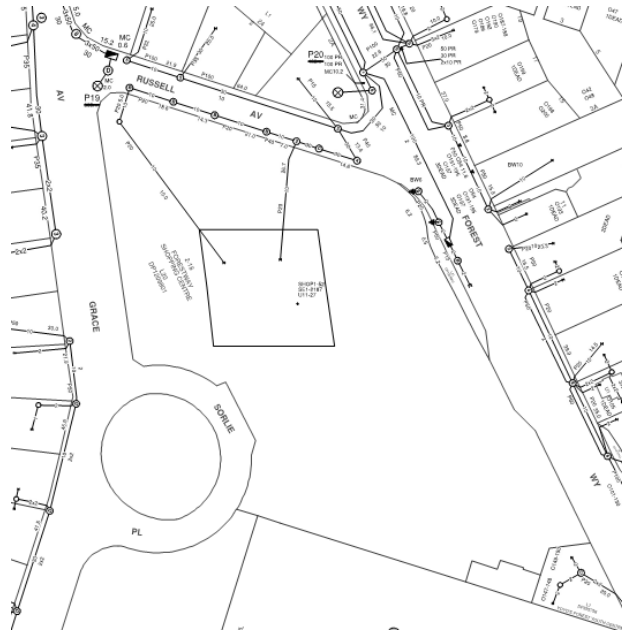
Existing Telstra Cable/Duct/Trench from Russell Ave
